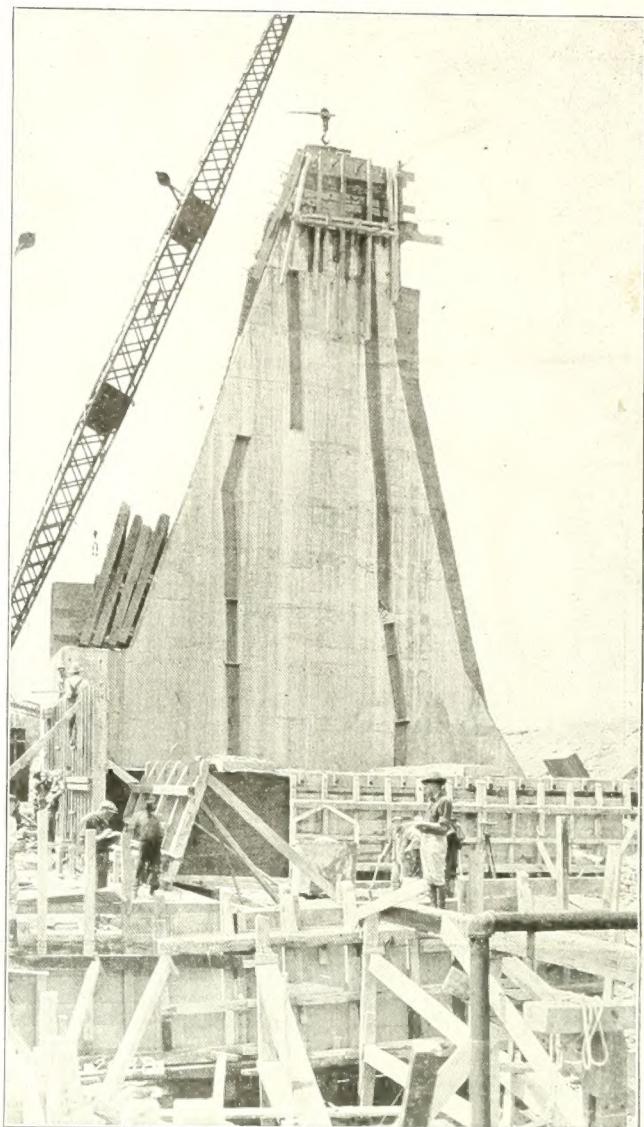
WEST WALL OF TAYLORSVILLE CONDUIT OUTLET, JULY 20, 1920.
